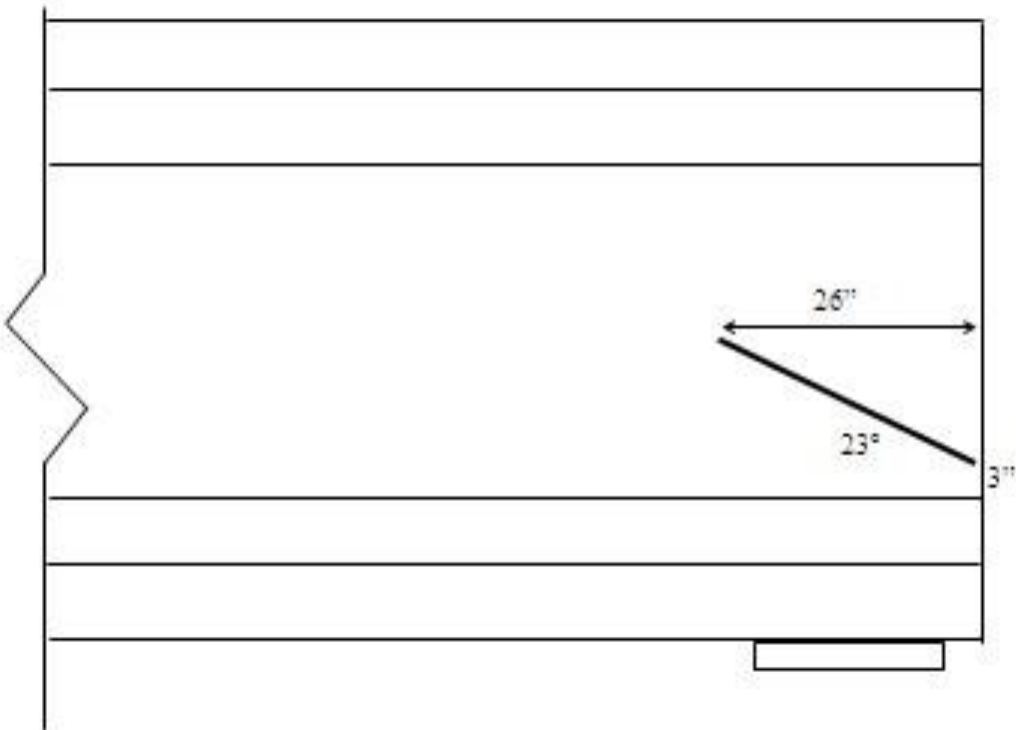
Crack diagram for girder 4th from east side, east face, north abutment (#1830).
